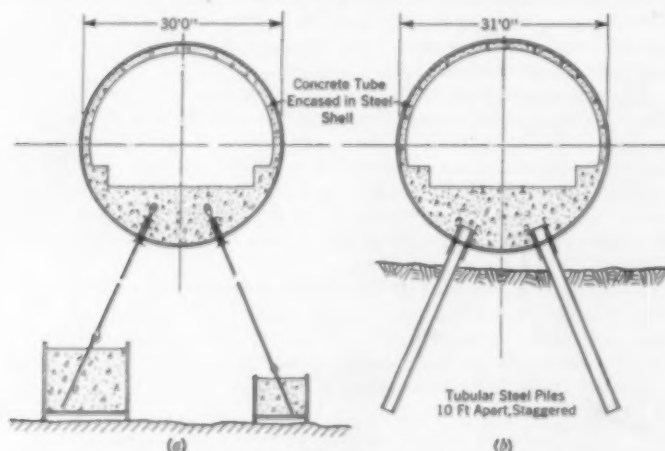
ALTERNATE PLANS FOR CONSTRUCTION OF TUNNEL ACROSS THE STRAITS OF MACKINAC
